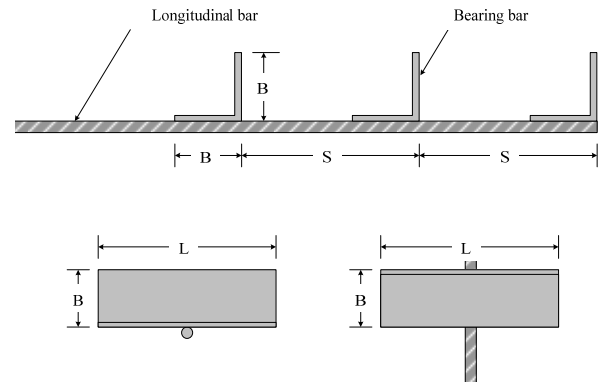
Configuration of the bearing reinforcement (Horpibulsuk and Niramitkornburee, 2010)
